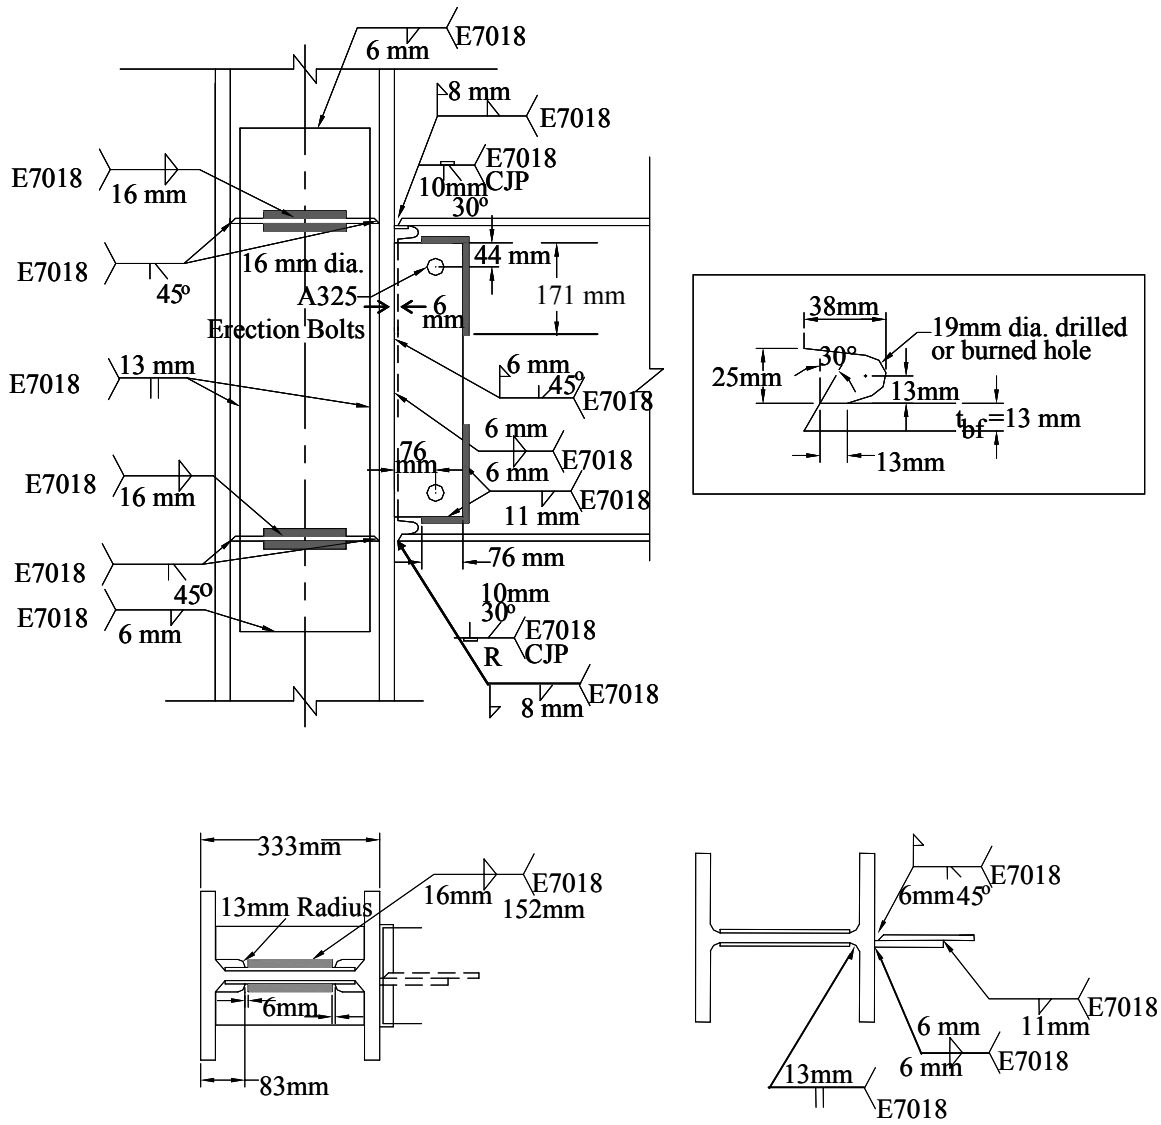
Weld details for connection in assemblage tests
